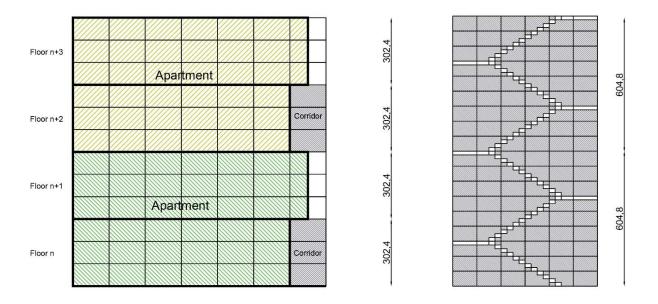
Proposed building structure section diagram and staircase section diagram.
